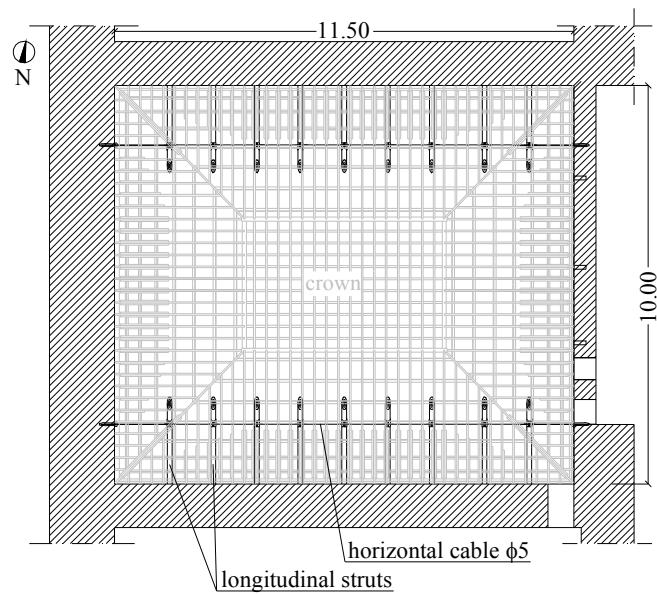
Third Anteroom (V) – Restoration interventions – Floor beam: disposition in plan of horizontal stiffening systems for longitudinal struts.
